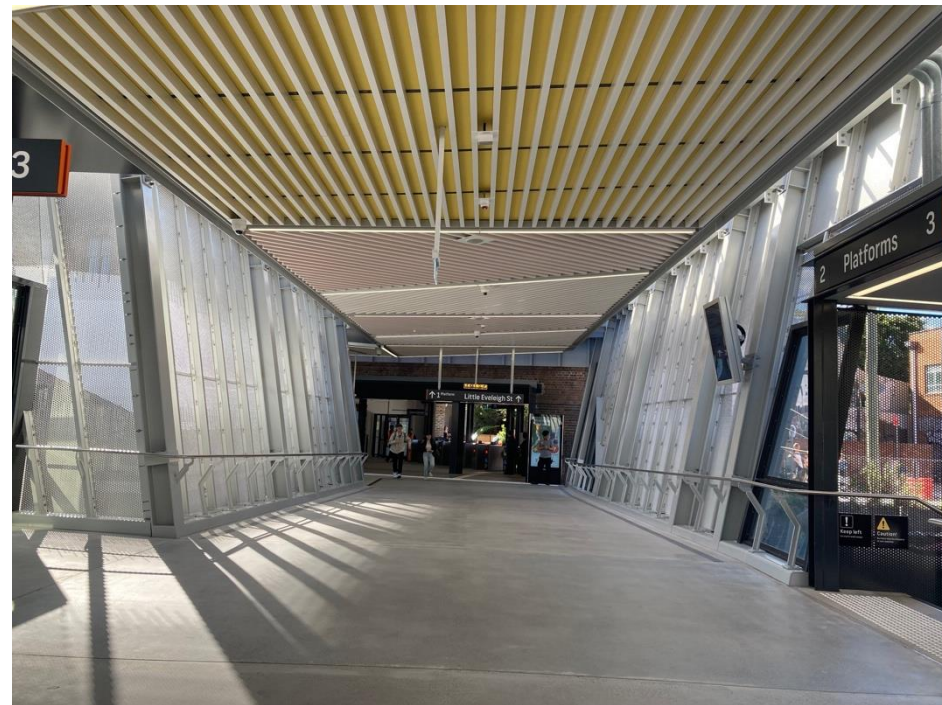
View of the new concourse, with stair and lift access to platforms 1-10.
